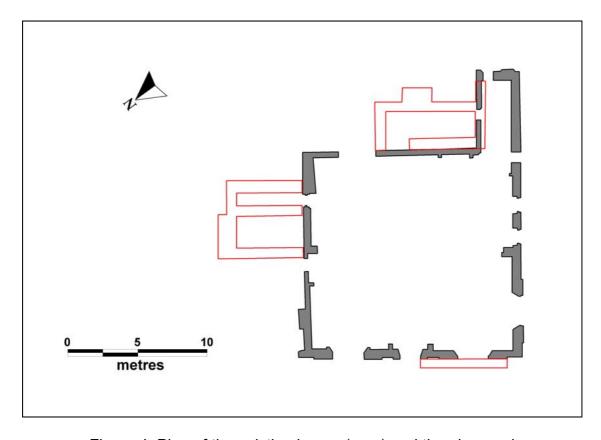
Plan of the existing house (grey) and the observed construction/inspection trenches (red)
